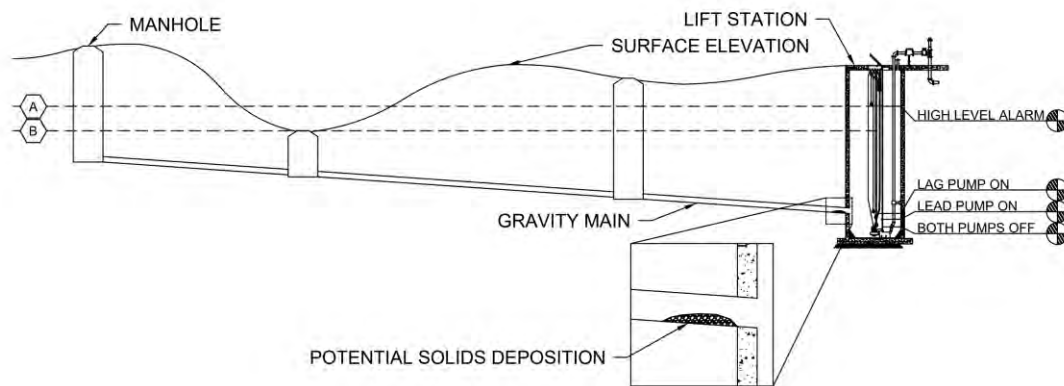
High-Level Alarm Impacts on Upstream Manhole Flooding
